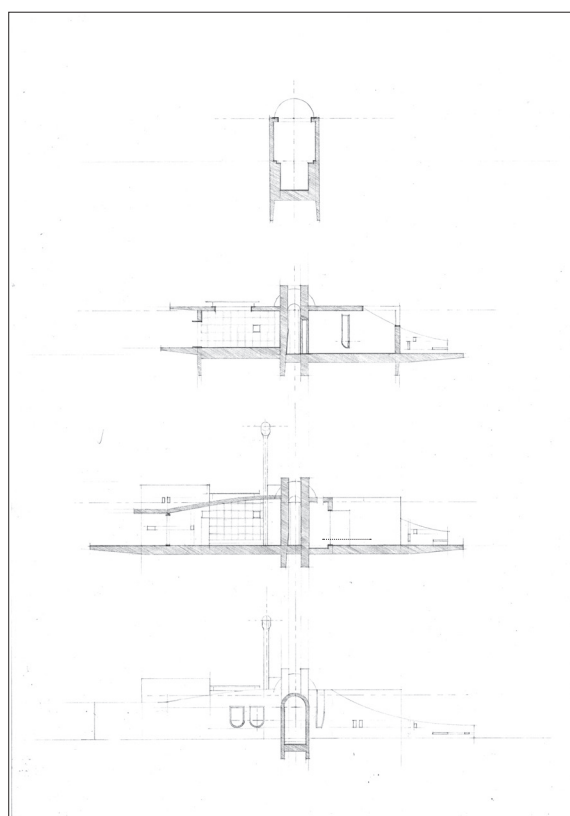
Forms and shapes of roof elements are transposed via compass tip from section to roof plan. Heights of lines and elements in section are also used to construct the projected shadow lines.
